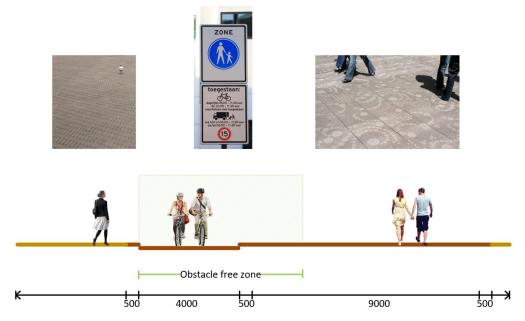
Cross-section alternative 2; photo's: (Dienst Stedelijke Ontwikkeling, 2021) (van Dijk, 2020)
